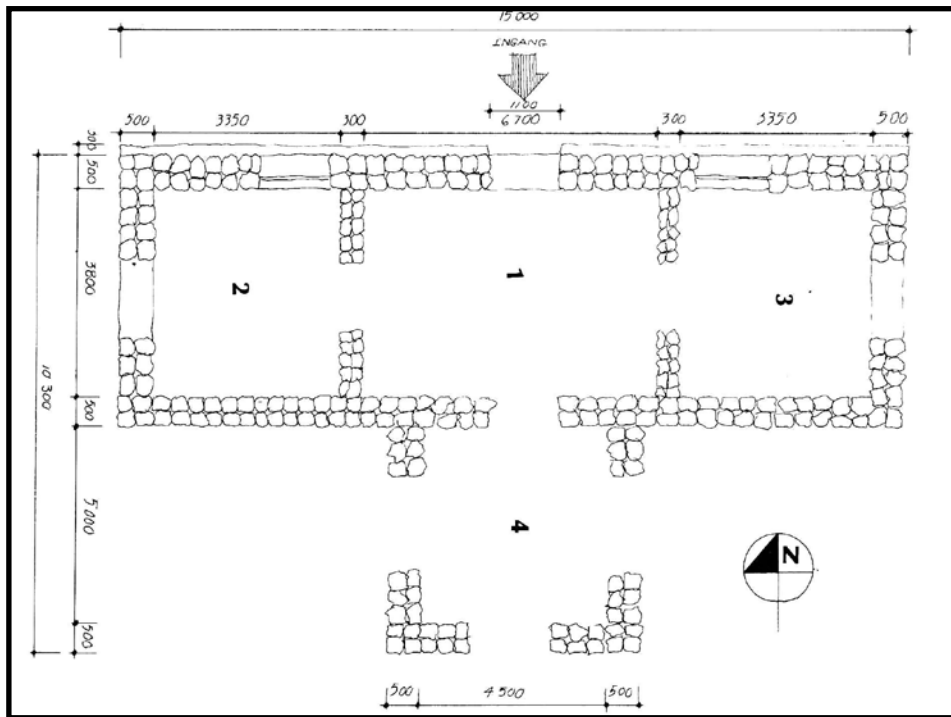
Floor plan of the main house (Nienaber, 1986: 24).
